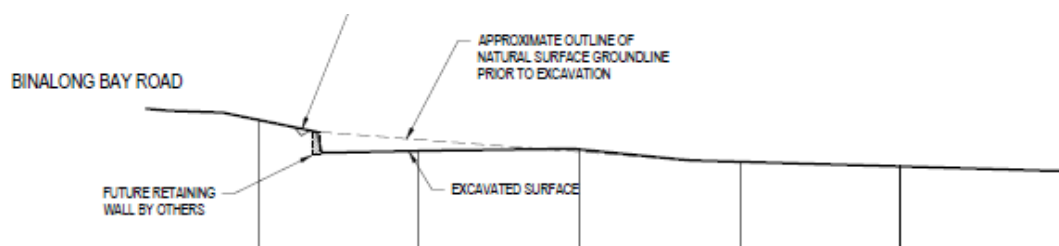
Proposed Retaining Wall – Longitudinal Section
